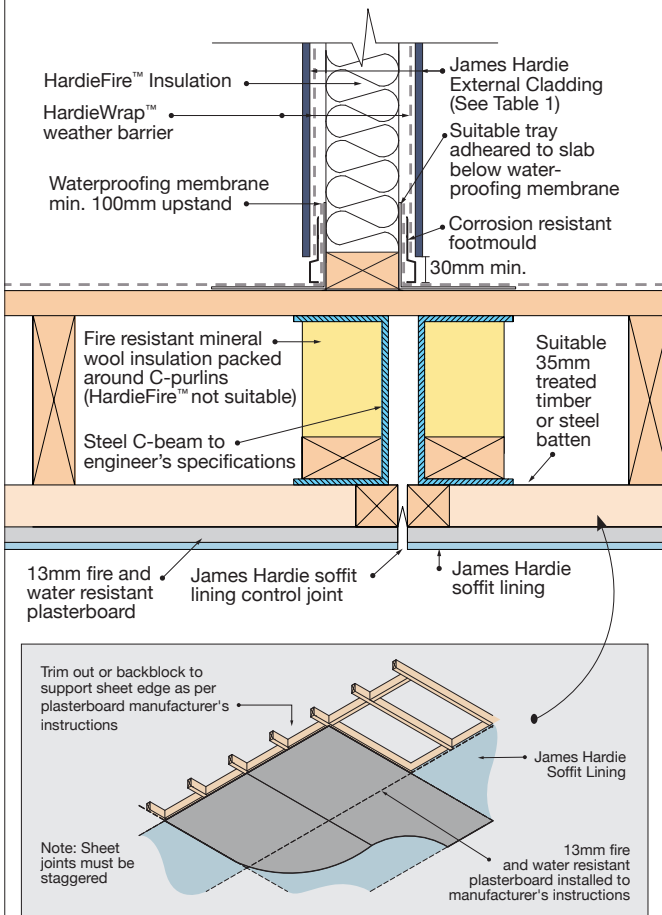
B HARDIESMART™ BLADE WALL SEPARATING CANTILEVERED BALCONY, OVER APPURTENANT CLASS 10A CARPORT BELOW
